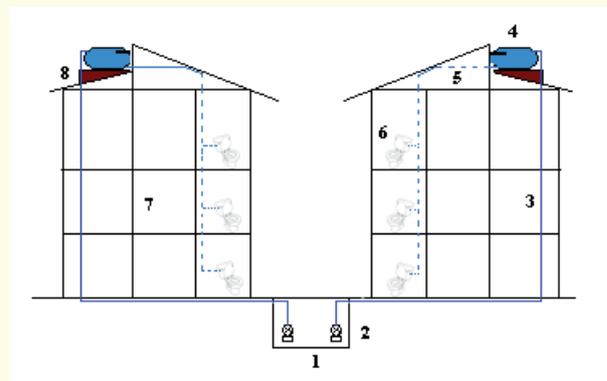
(1) Underground storage tank, (2) submersible pumps, (3) pipe connections, (4) elevated storage tank 2 m3, (5) pipe connection, (6) flush toilet reservoir, (7) multi-storey buildings, (8) support for elevated tank.
